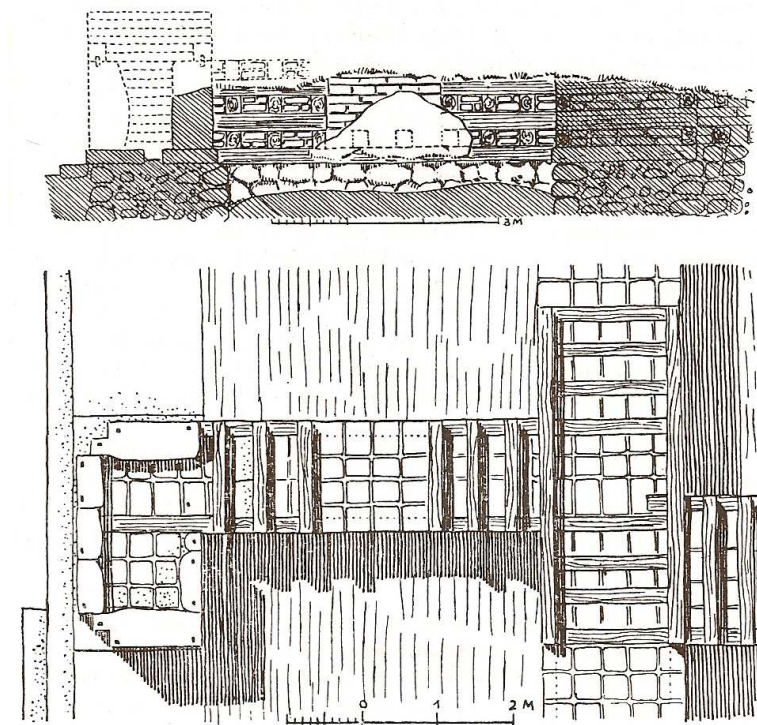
9Sketches of the wall construction of the Lower Palace of Zincirli.(Naumann, R. 1985)
